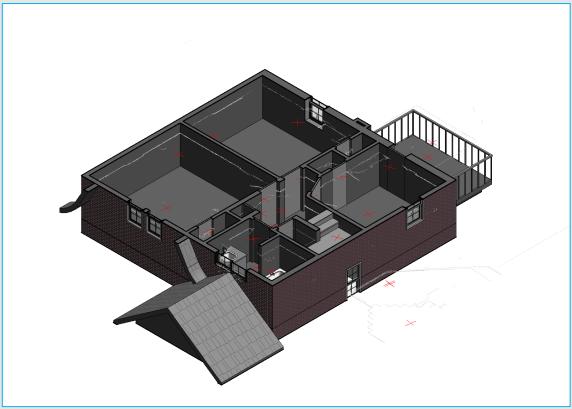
Premium Second Floor Plan Output as Per 3D View in Revit
